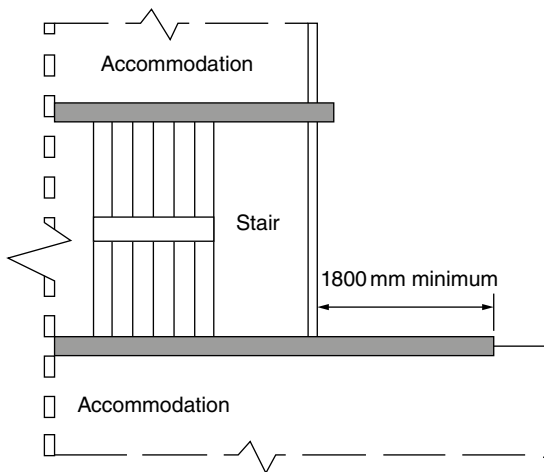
External protection – protected stairway projecting beyond façade.
